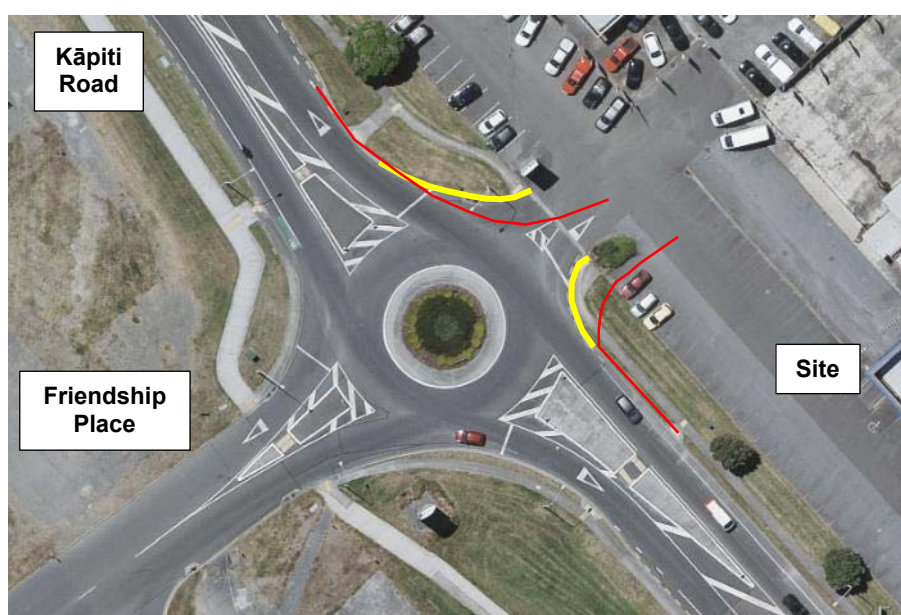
Existing Kāpiti Road / Friendship Place Roundabout (Fourth Arm Highlighted)
